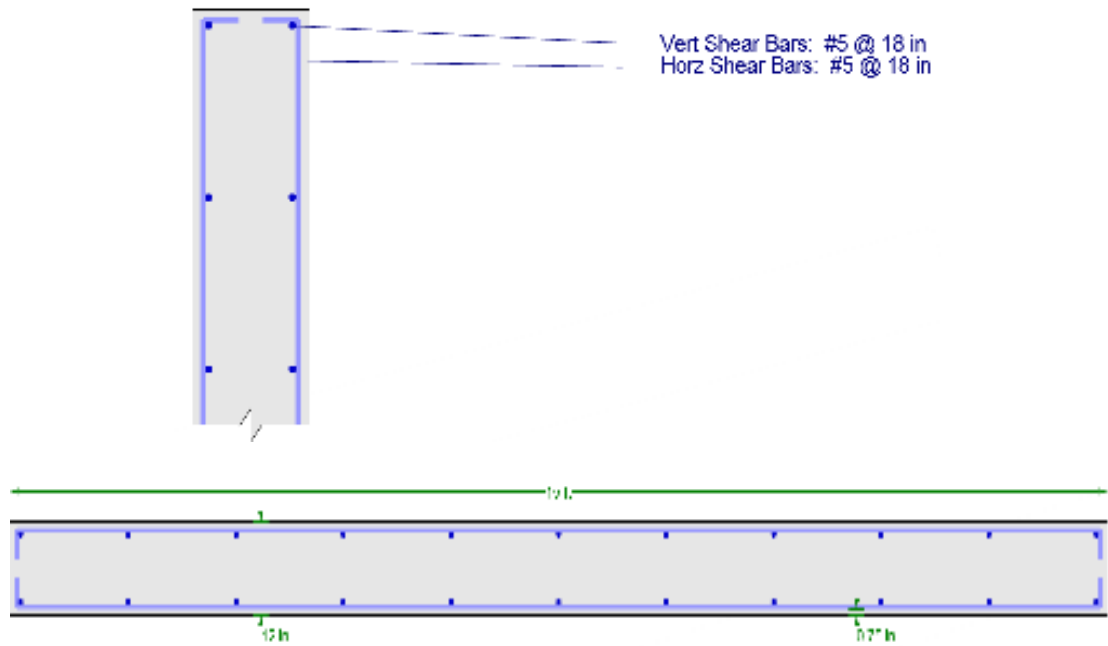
Building (B12-12S-L-O) Ordinary RC Shear Reinforcement Details; Wall Section for Floors 7-9
